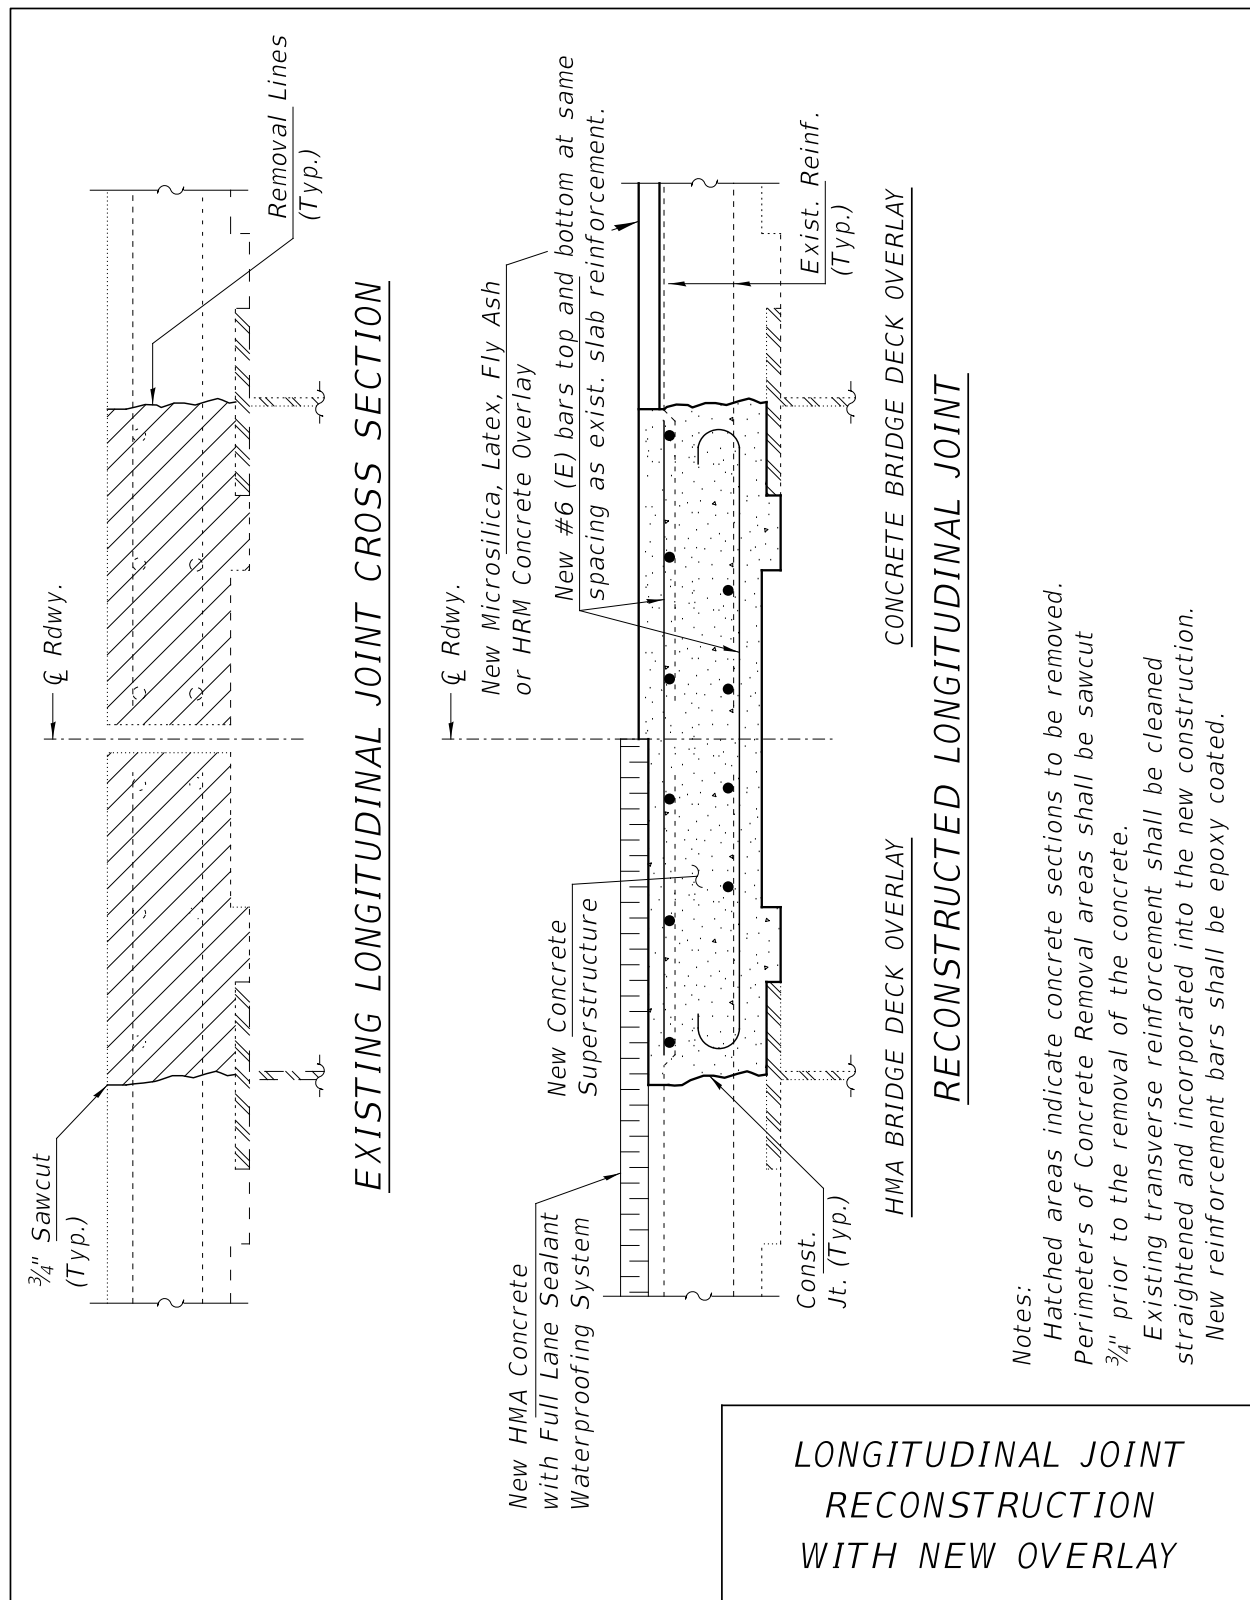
Longitudinal Joint Reconstruction with New Overlay
